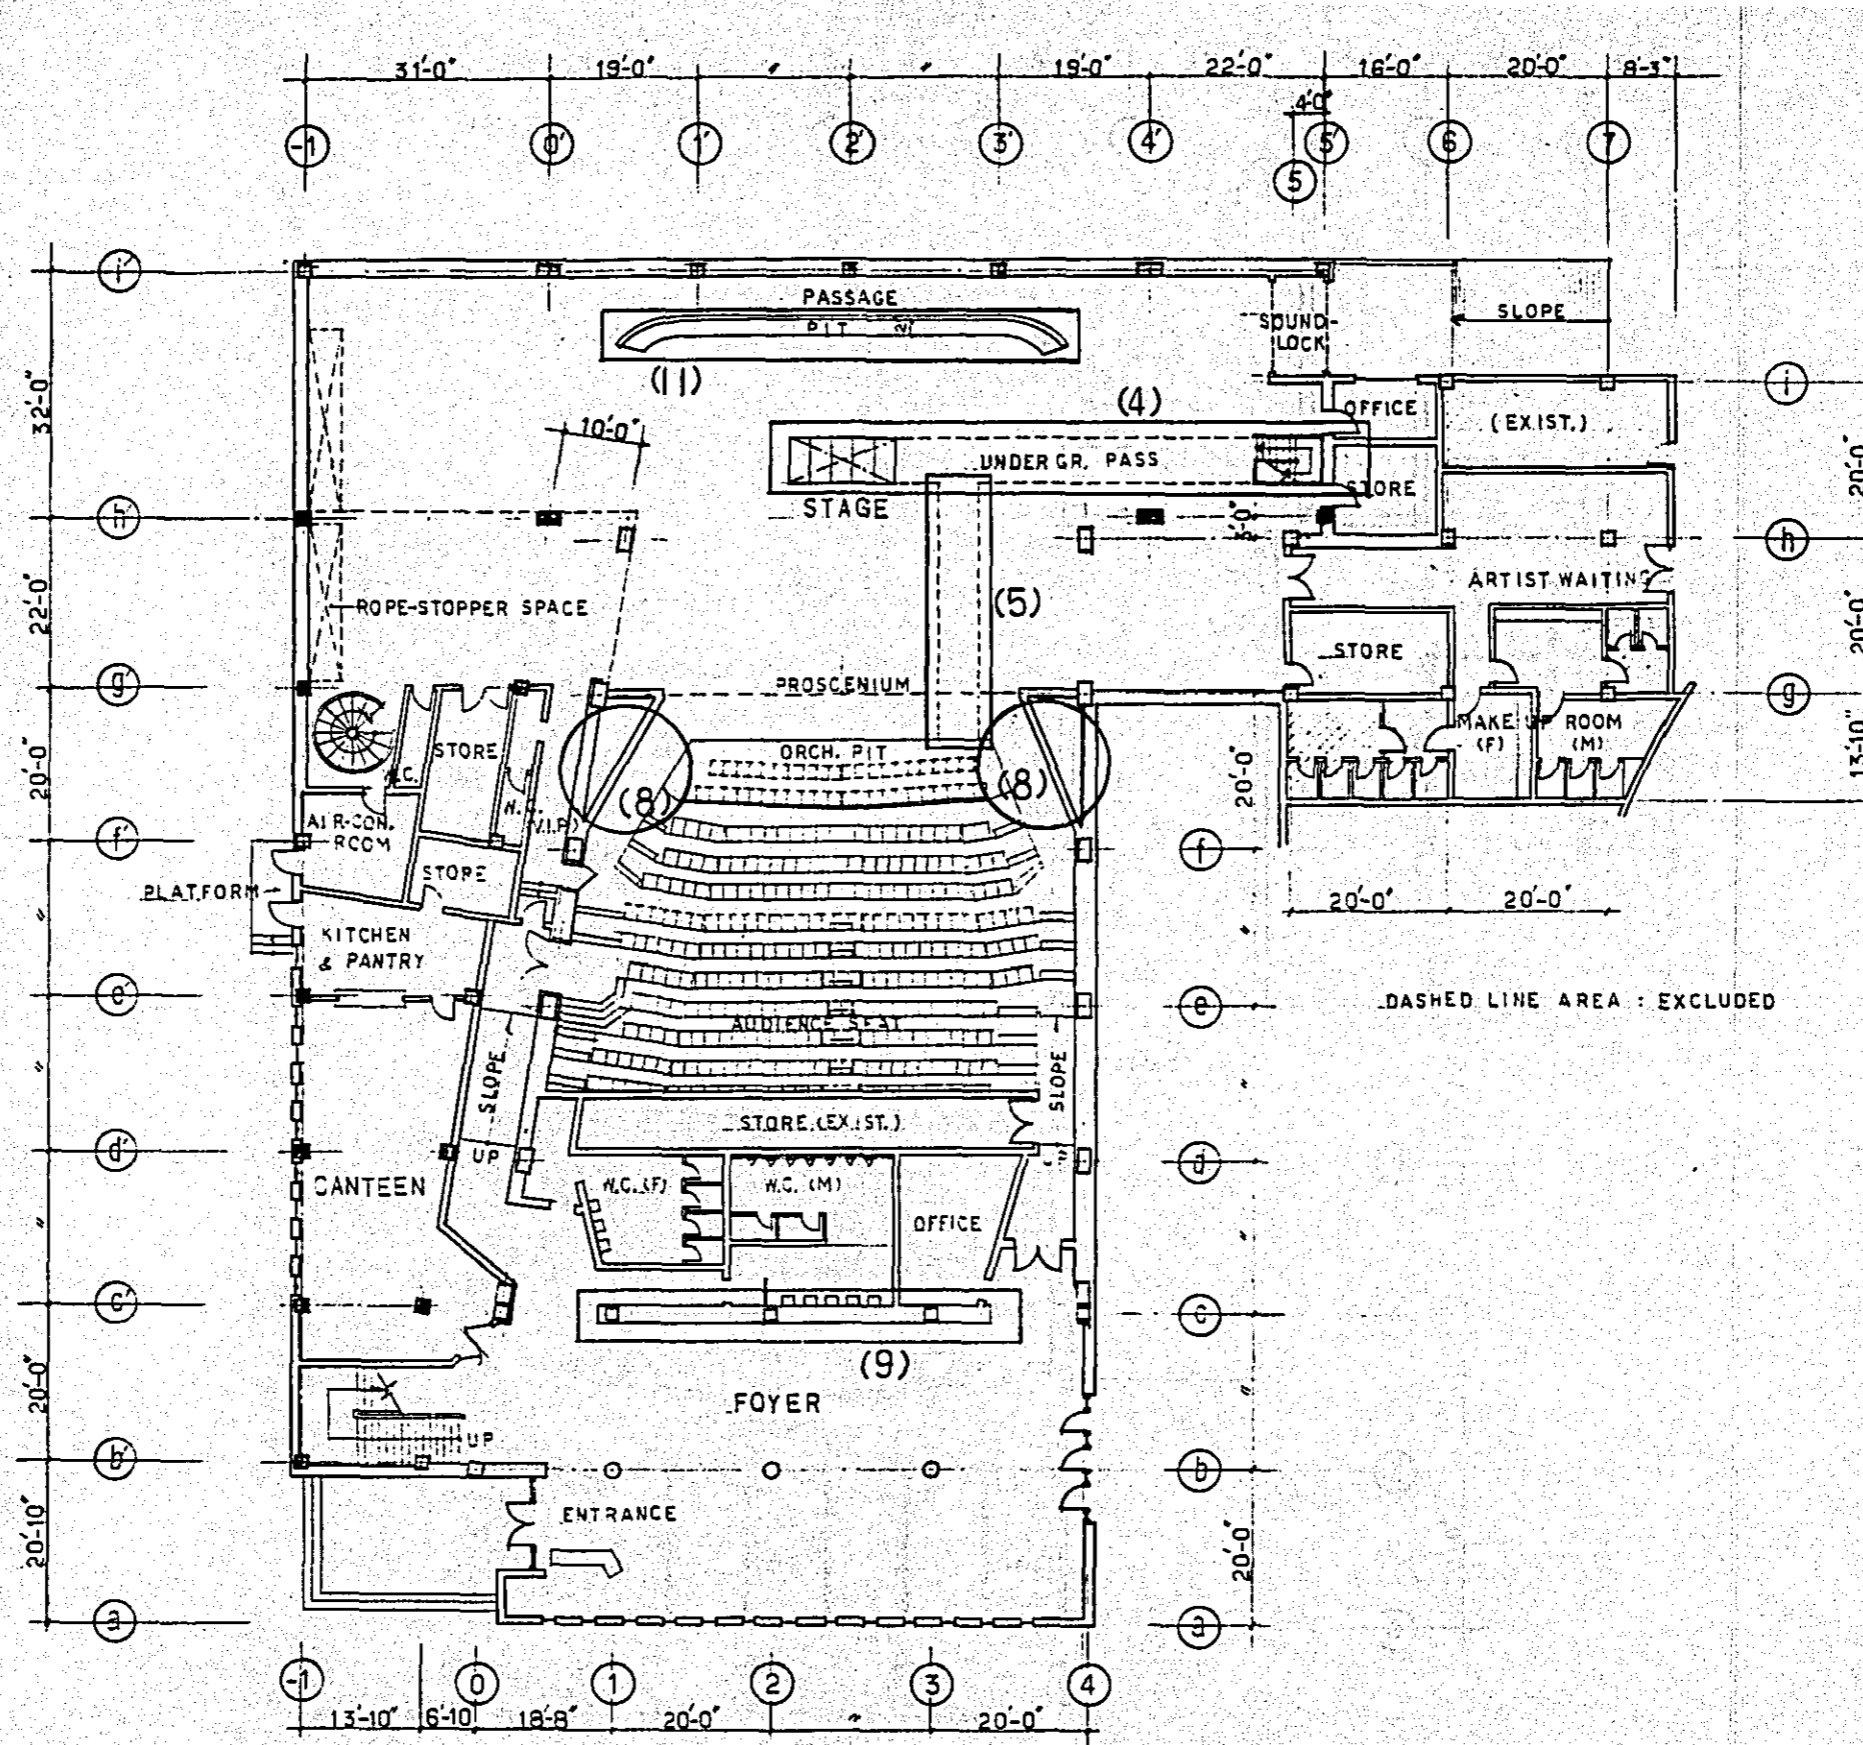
PLAN - GROUND FLOOR SCALE: 1/200
